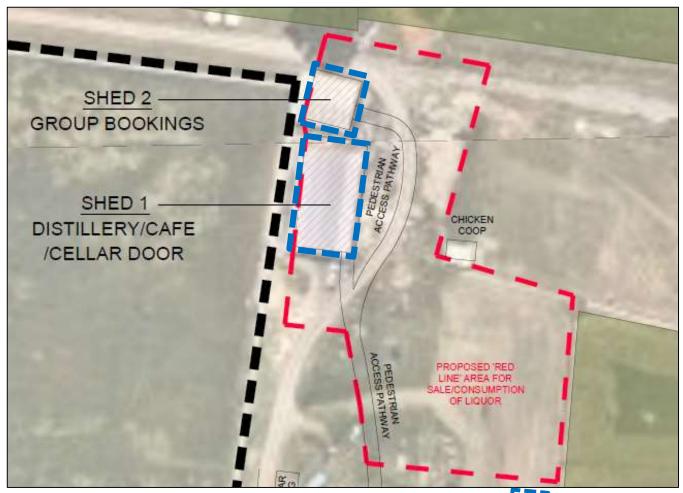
Existing Buildings (denoted with dashed blue outlines)
